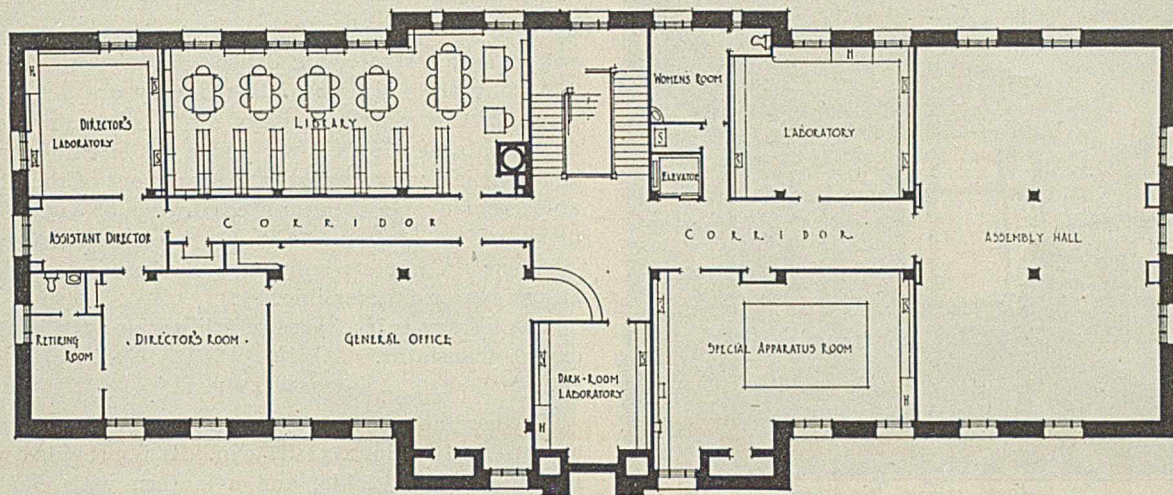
FIRST FLOOR PLAN, MELLON INSTITUTE OF INDUSTRIAL RESEARCH
